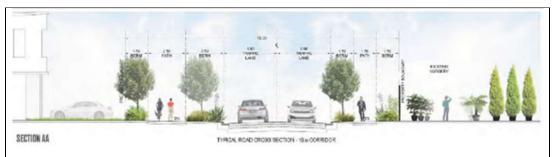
Entry Road Cross-Section (Prepared by Development Nous)
